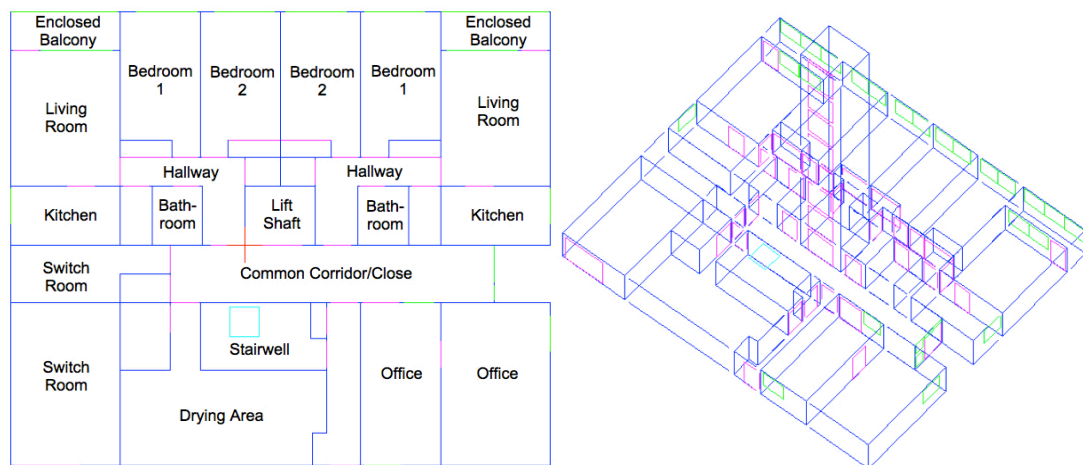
Ground floor representation of 70 Broadholm Street, Glasgow in plan view (L) and axonometric view (R).
